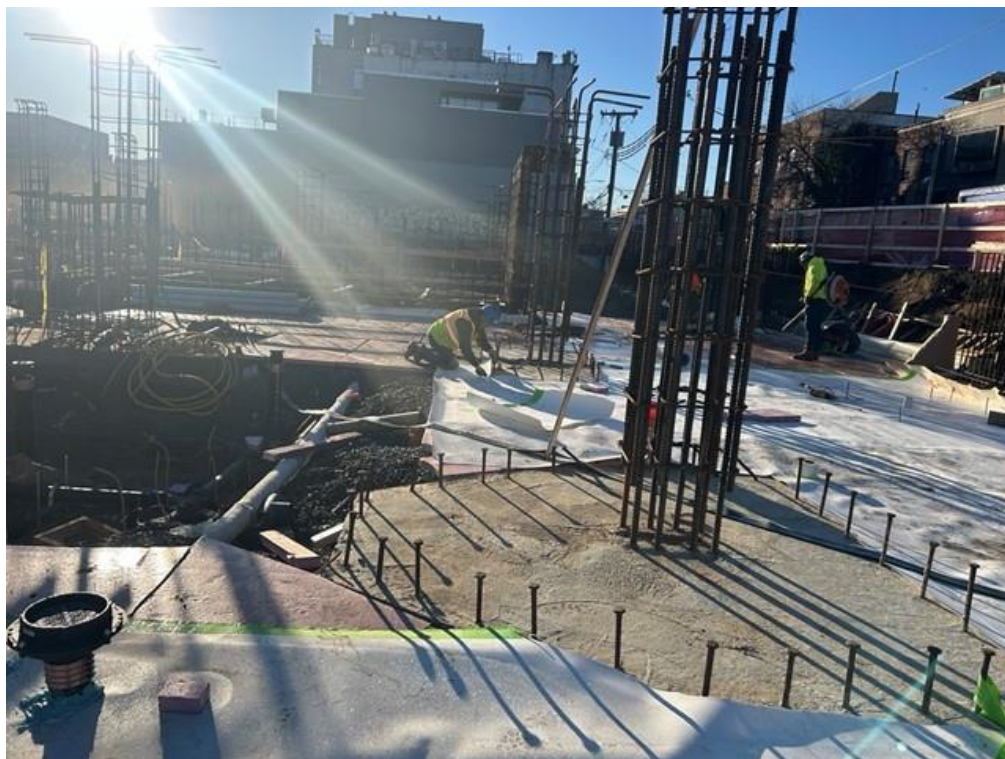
ECD installing Preprufe 300R Plus waterproofing/vapor barrier membrane atop rat slab in the western part of the site (facing southeast)
